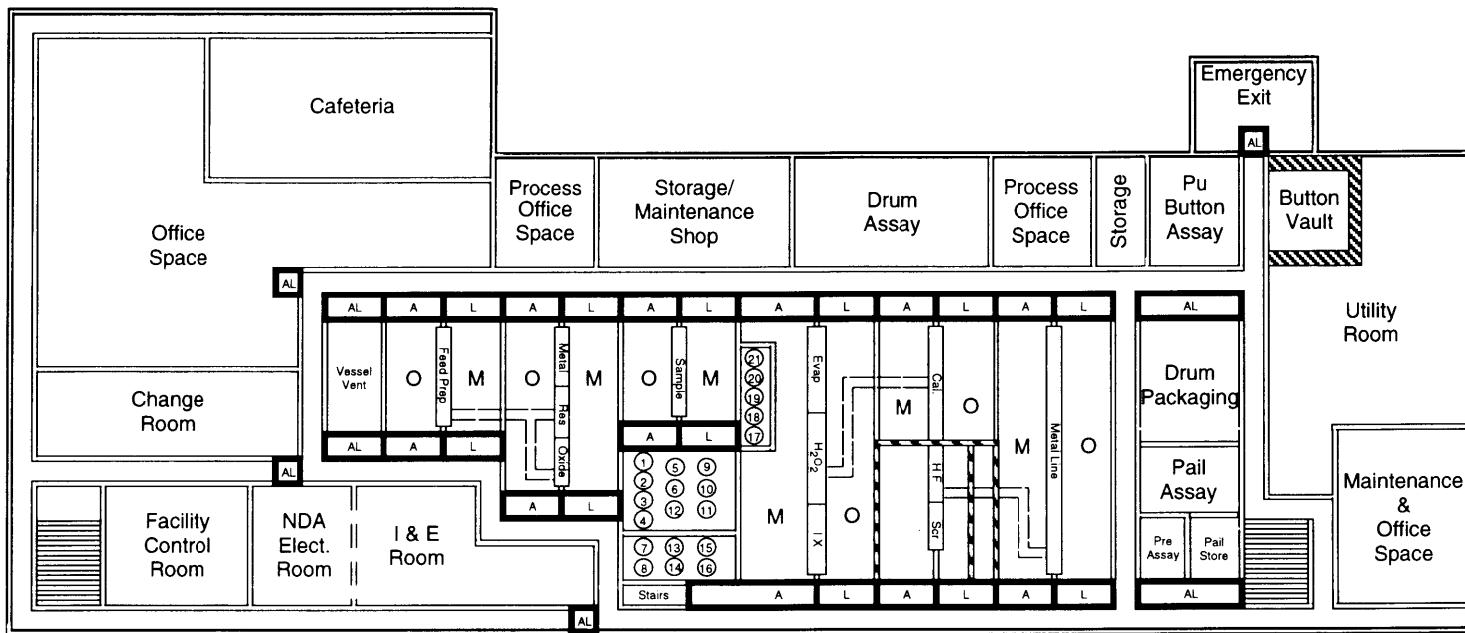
Plutonium Recovery Facility First Level Floor Plan
